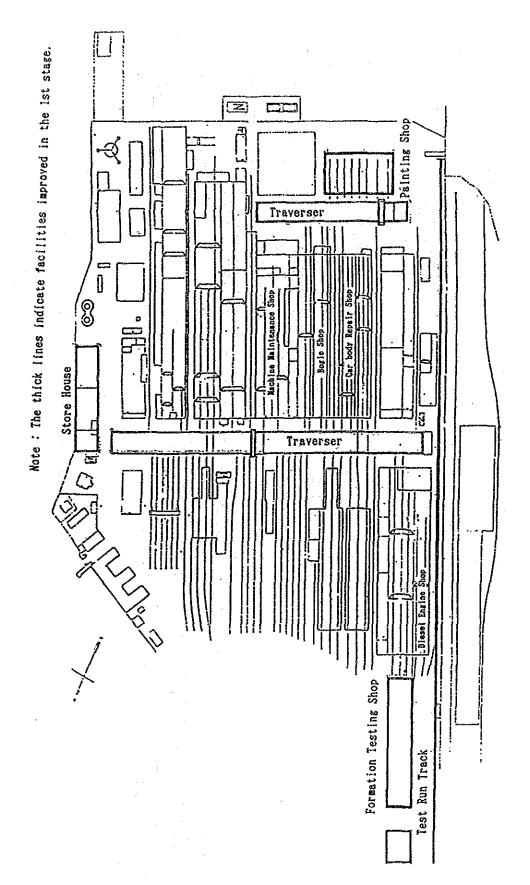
Layout of Existing Manggarai Workshop
